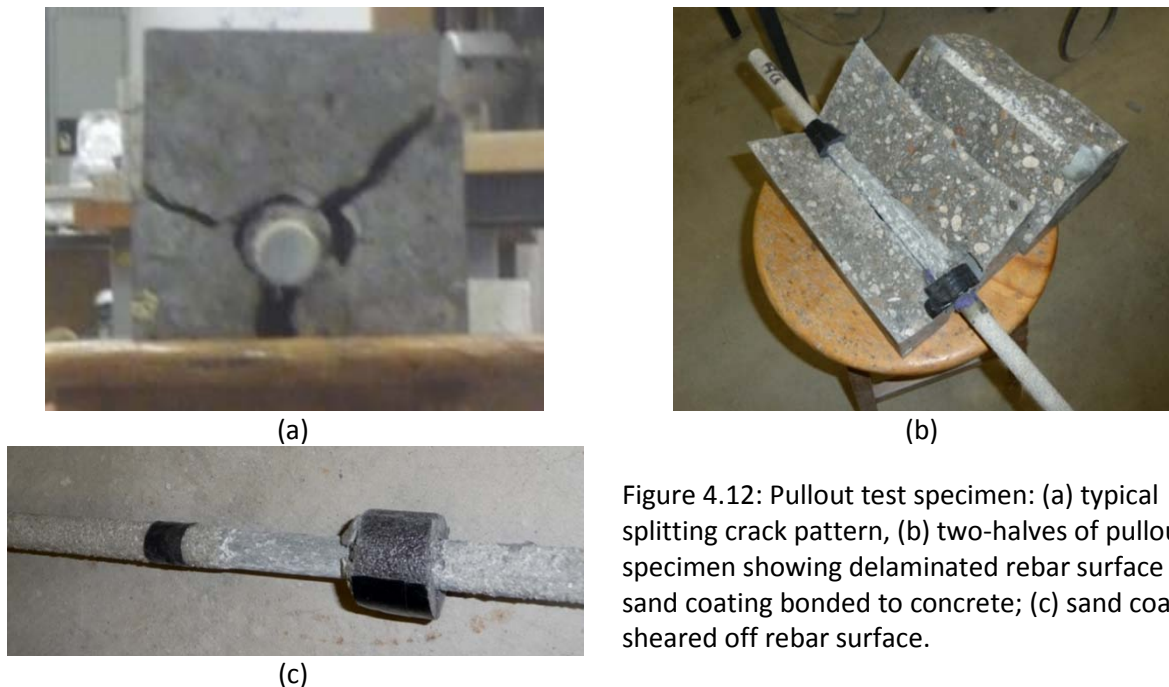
Pullout test specimen: (a) typical splitting crack pattern, (b) two-halves of pullout specimen showing delaminated rebar surface and sand coating bonded to concrete; (c) sand coating sheared off rebar surface.
